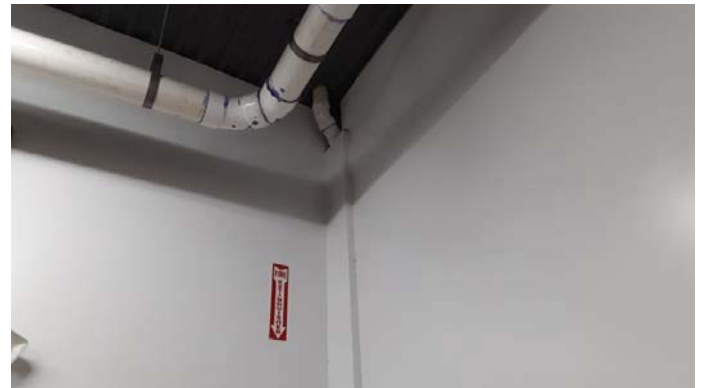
SVI Roof Vent (left pipe) – Southwest interior building corner
